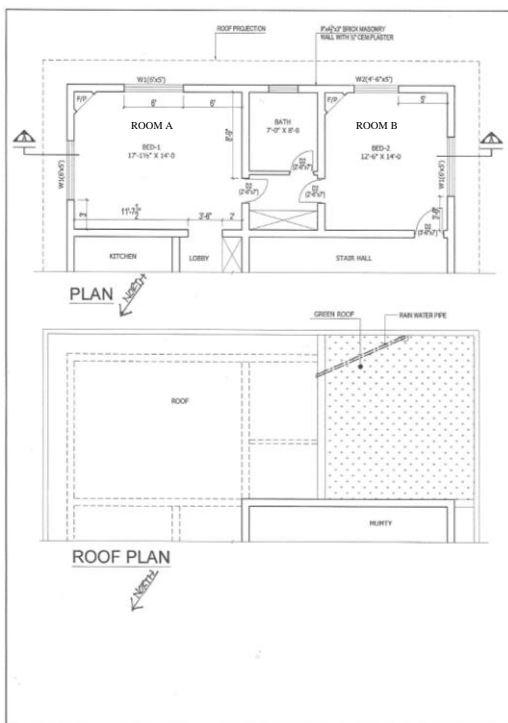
Plan and roof plan of the as-built existing structure for the study
